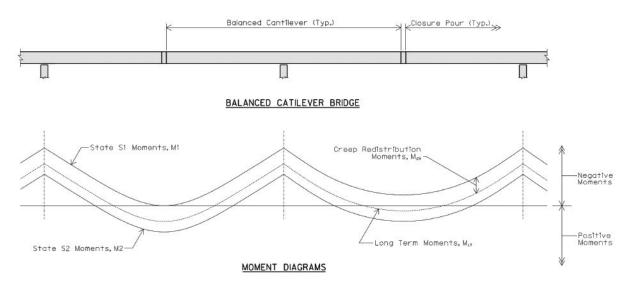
Creep redistribution in a concrete segmental bridge constructed using the balanced-cantilever method.
